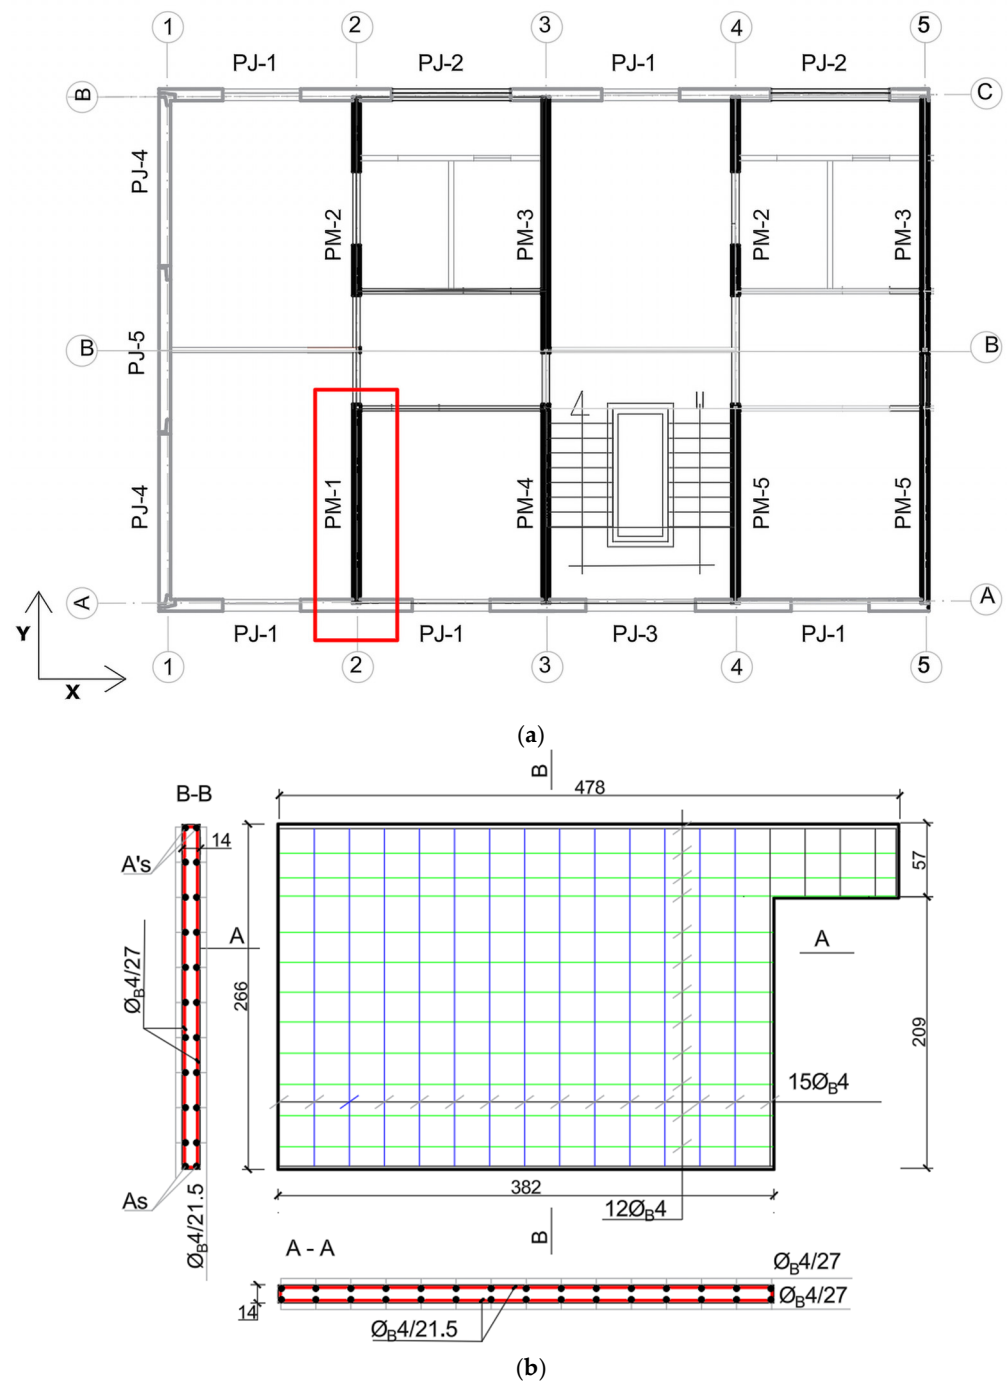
Wall panel PM-1: (a) typical floor plan showing the panel location; (b) panel dimensions and reinforcement.
